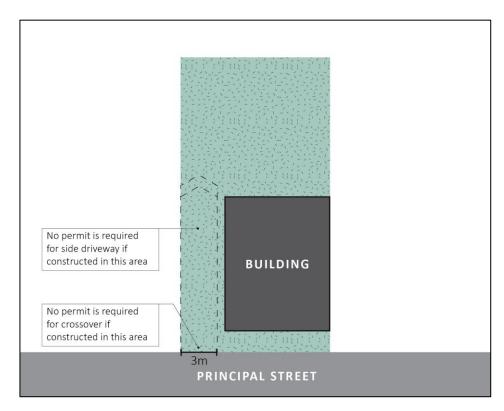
Construction of a new crossover and driveway is permit exempt if constructed in this location.
